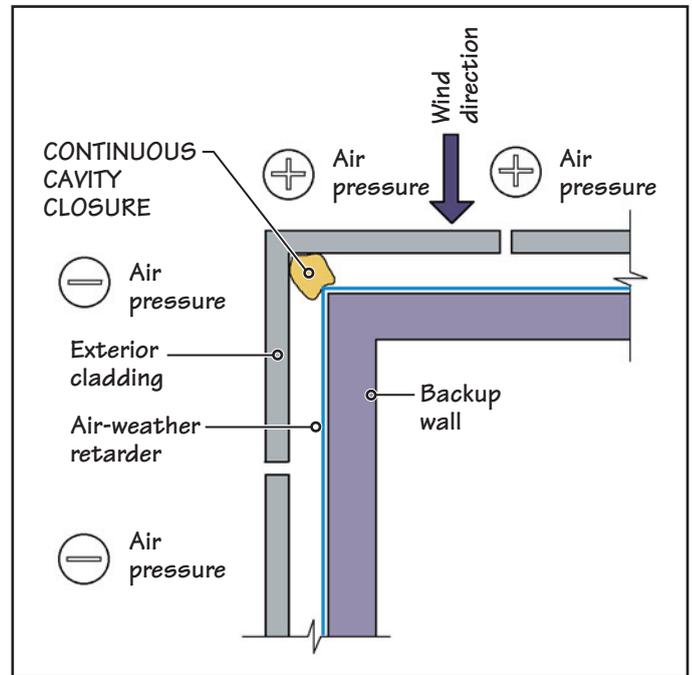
To prevent air movement within the air space, the air space should be divided into small sections with continuous cavity closures, particularly at corners and floor levels.
